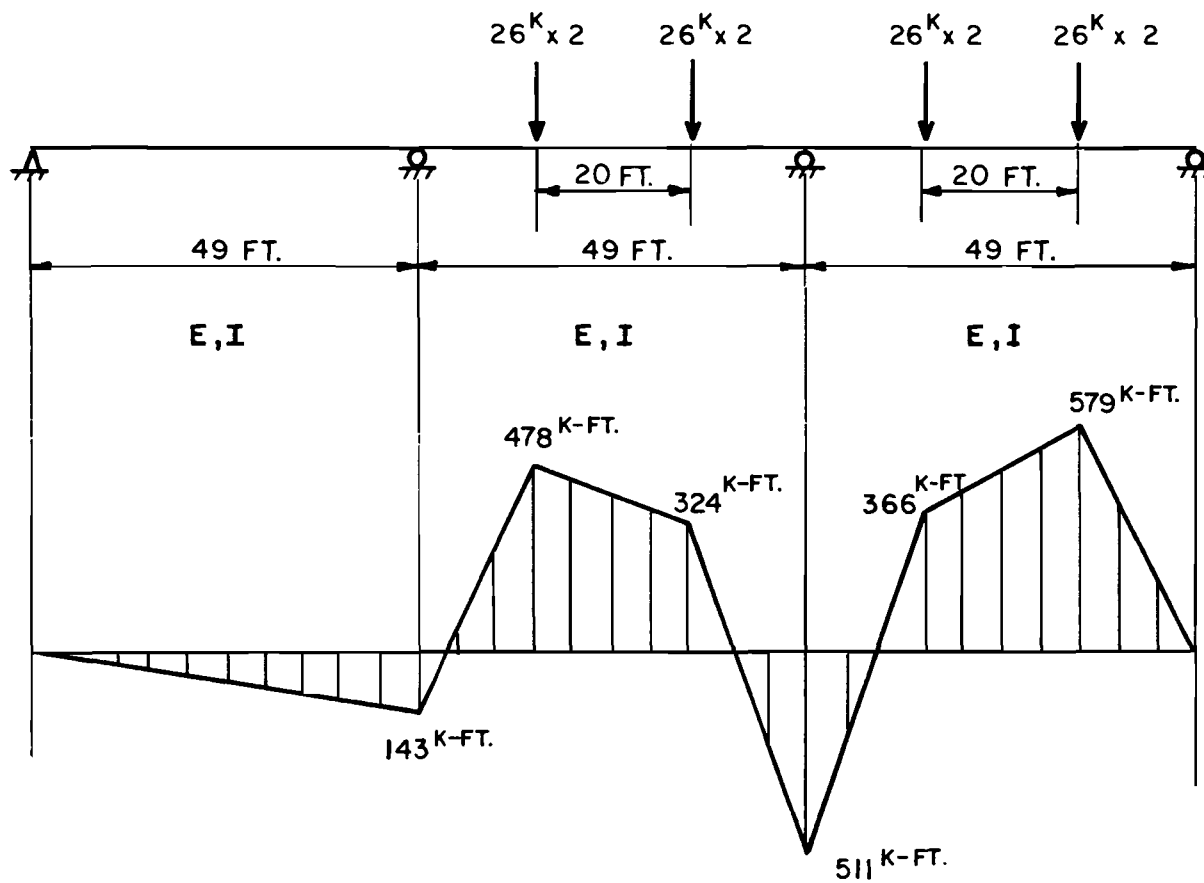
Loading of typical continuous bridge structure showing maximum moment at support
